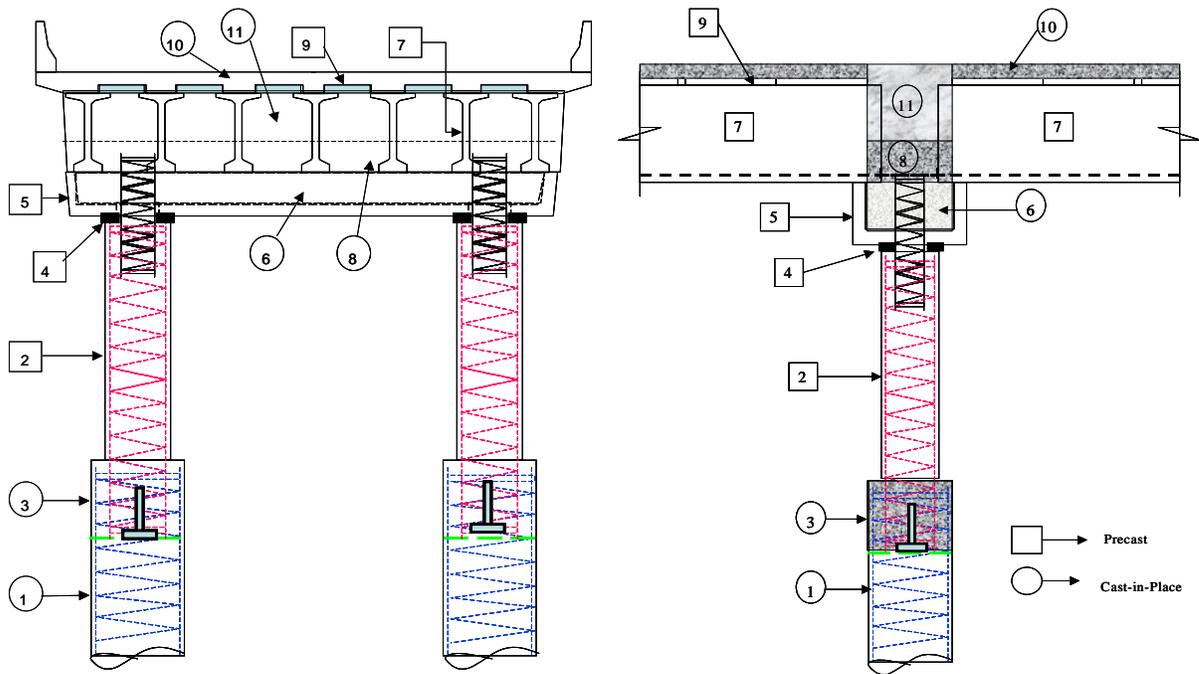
Precast Seismic Resistant Bridge – Elevation (Left) – Section (Right)
